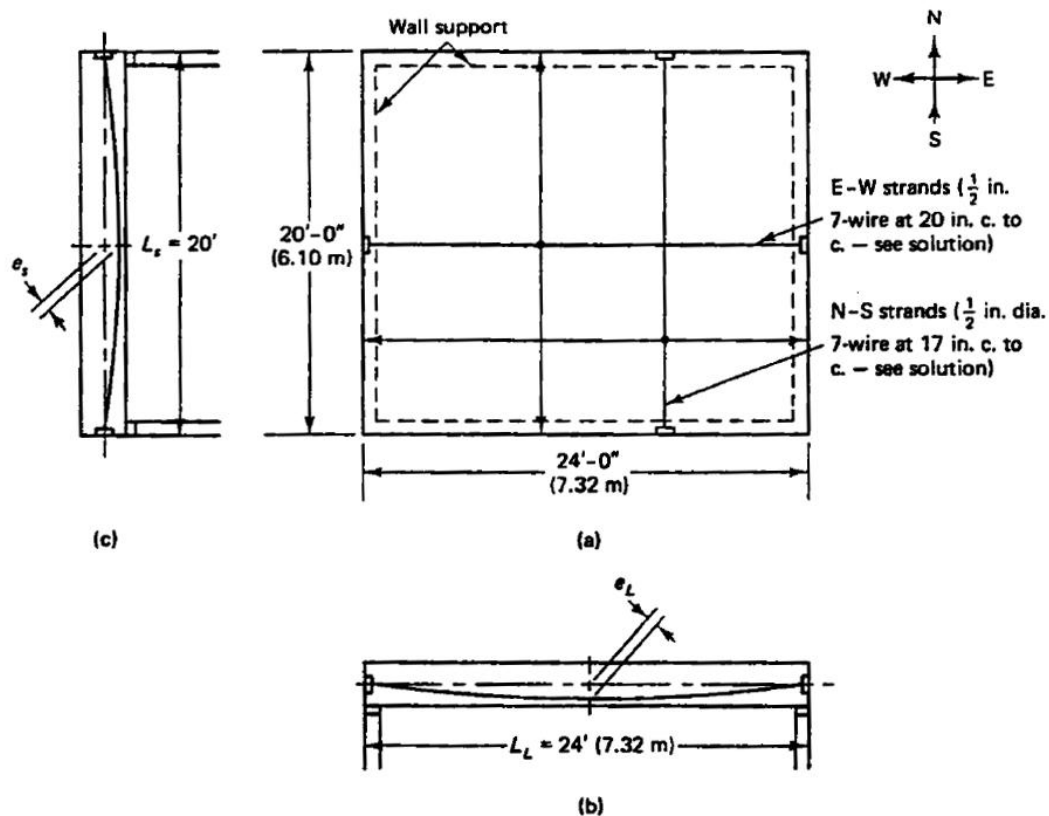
Two-way prestressed panel in Example 9.1. (a) Plan. (b) Section in longitudinal E-W direction. (c) Section in transverse N-S direction.
